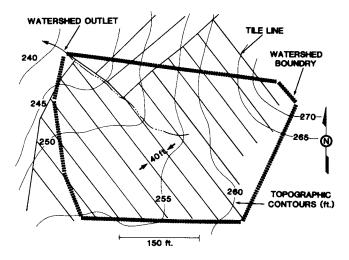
Perforated plastic drain tube was installed at forty foot spacing covering a 2.3 acre sub-watershed.
